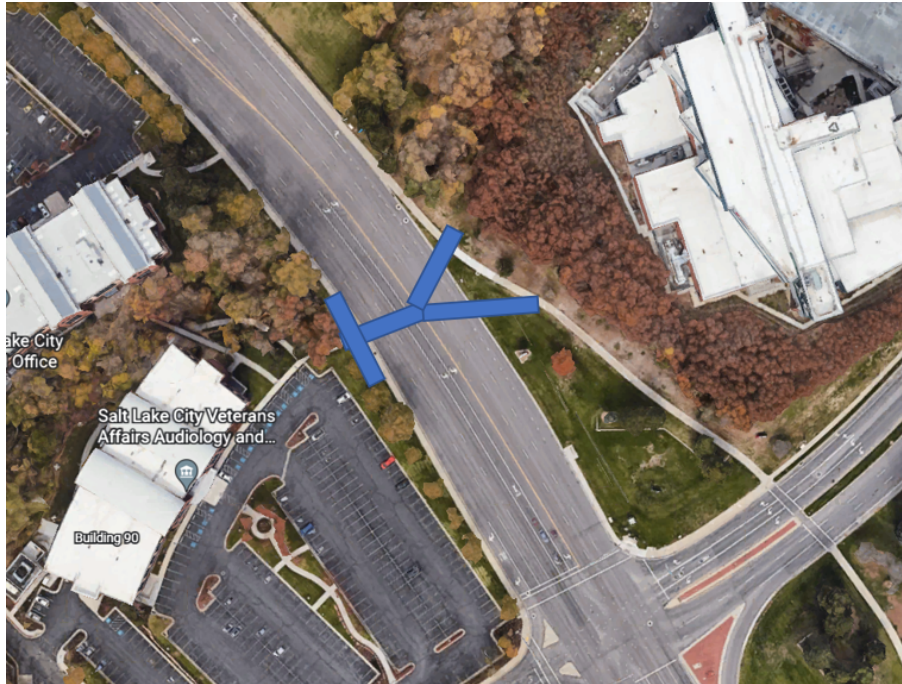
Plan View of Forked Bridge: the west side includes a ramp with north and south approaches. The truss bridge forks out on the east side to meet the trail connection and the sidewalk for transit access. A bridge pier will land on the inner left turn lane in the road [11].
